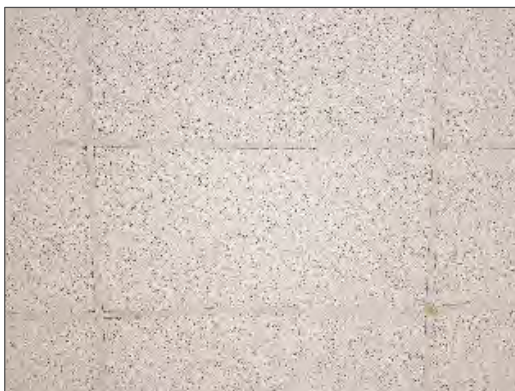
Non-asbestos lay-in acoustic ceiling tile present within the assessed area.
